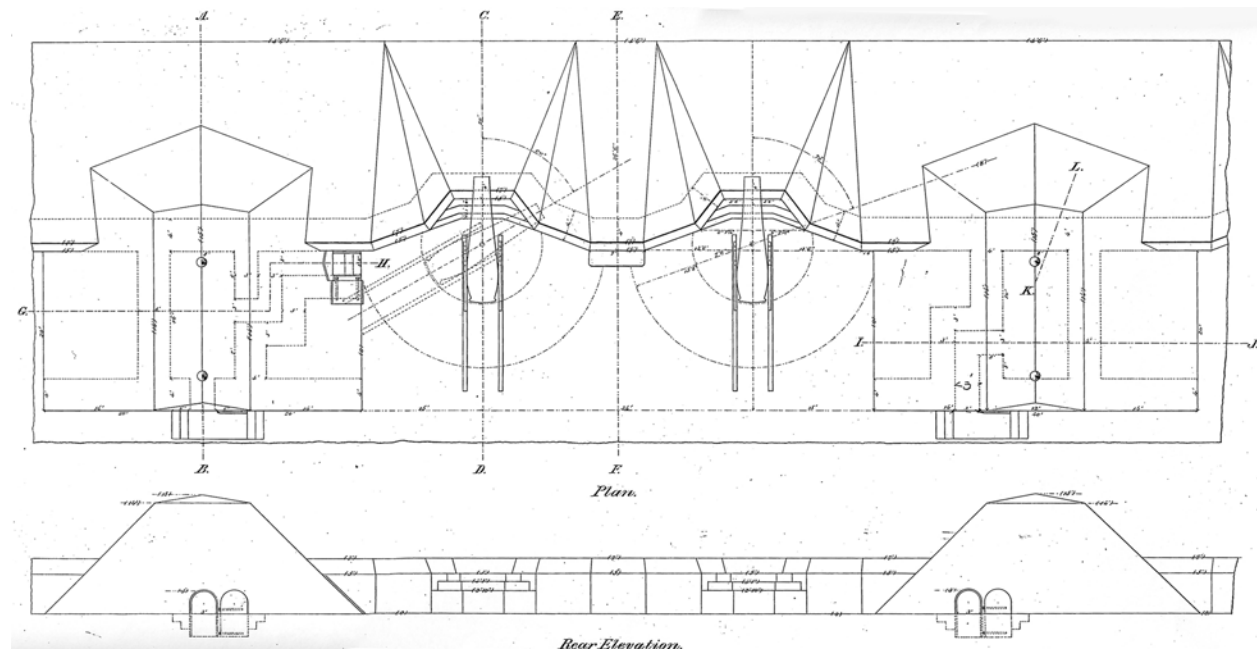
Prototypical plan of an earthwork emplacement: “Plans Sections and Elevations of a Barbette Battery as Proposed by the Board of Engineers for Fortifications,” 1868. *NARA RG 77, Dr. 155, Sht. 14.
